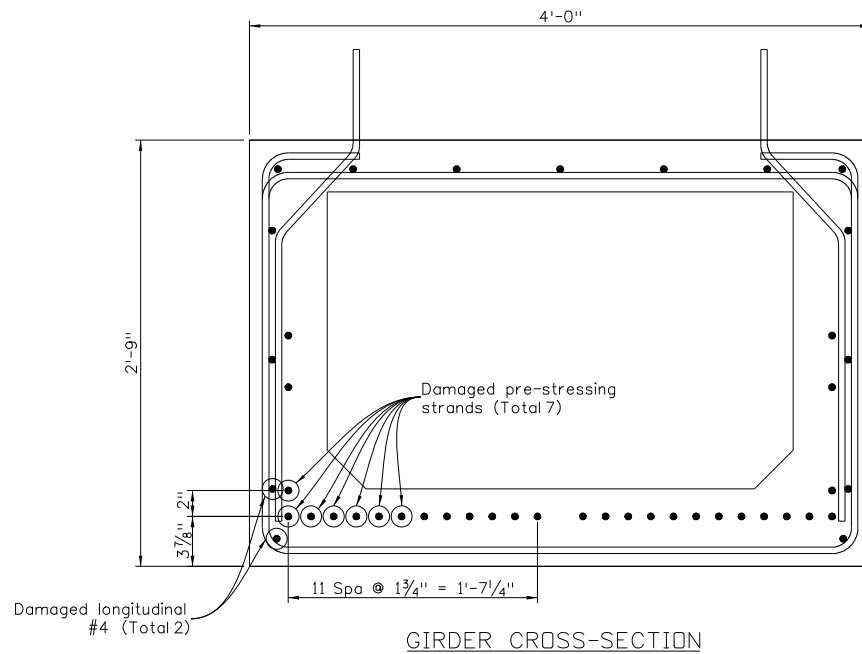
(E)-4 Sample Section of Precast Girder Repair
